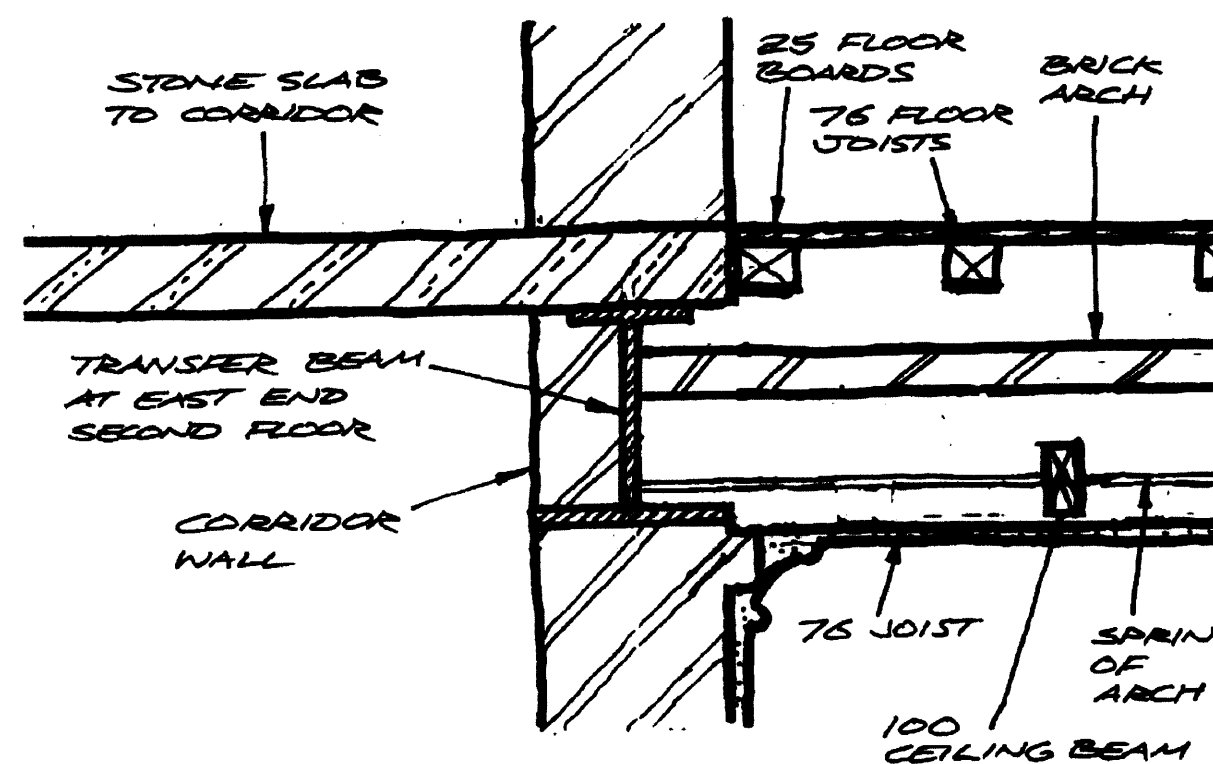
Room/Corridor Interface second floor, east end, transfer beam in wall (SK084)
